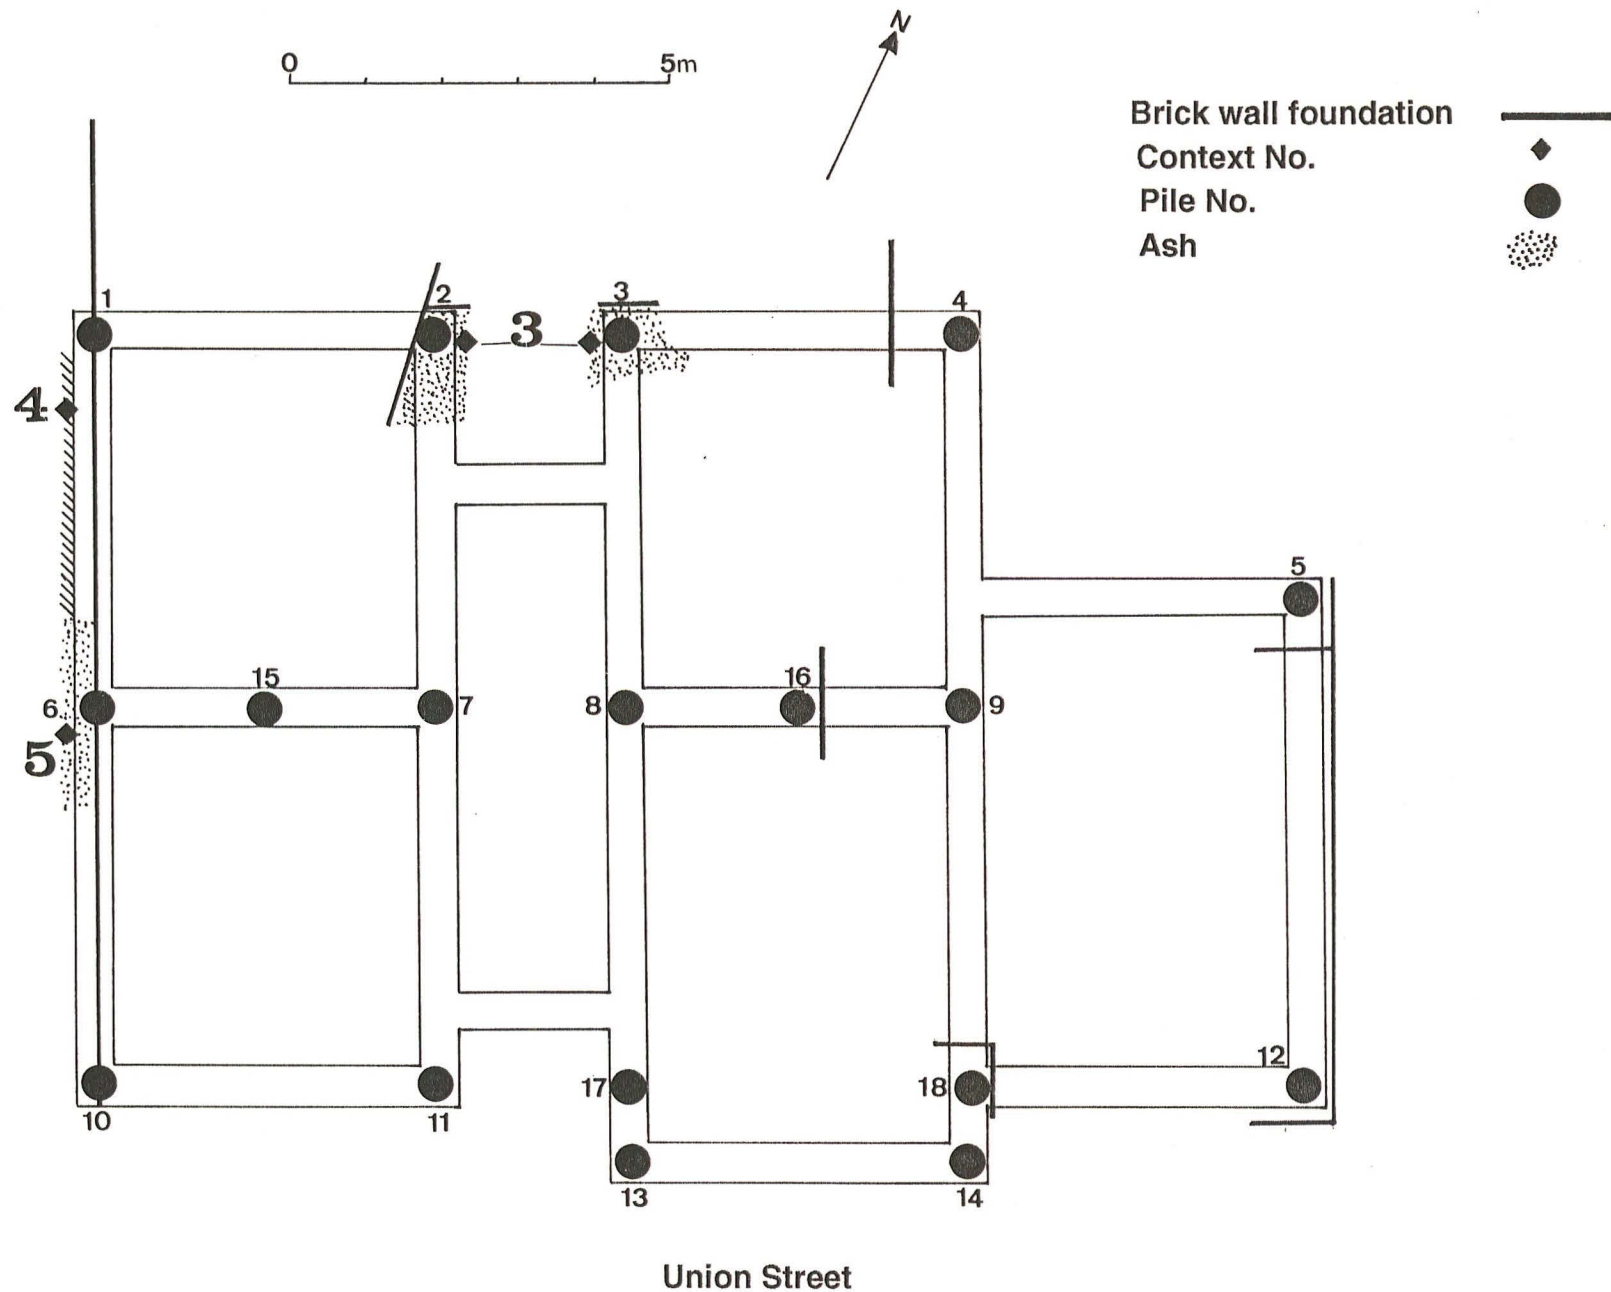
Plan of Pile positions and Ground Beam trenches, showing archaeological observations (based on a plan supplied by the developer)
